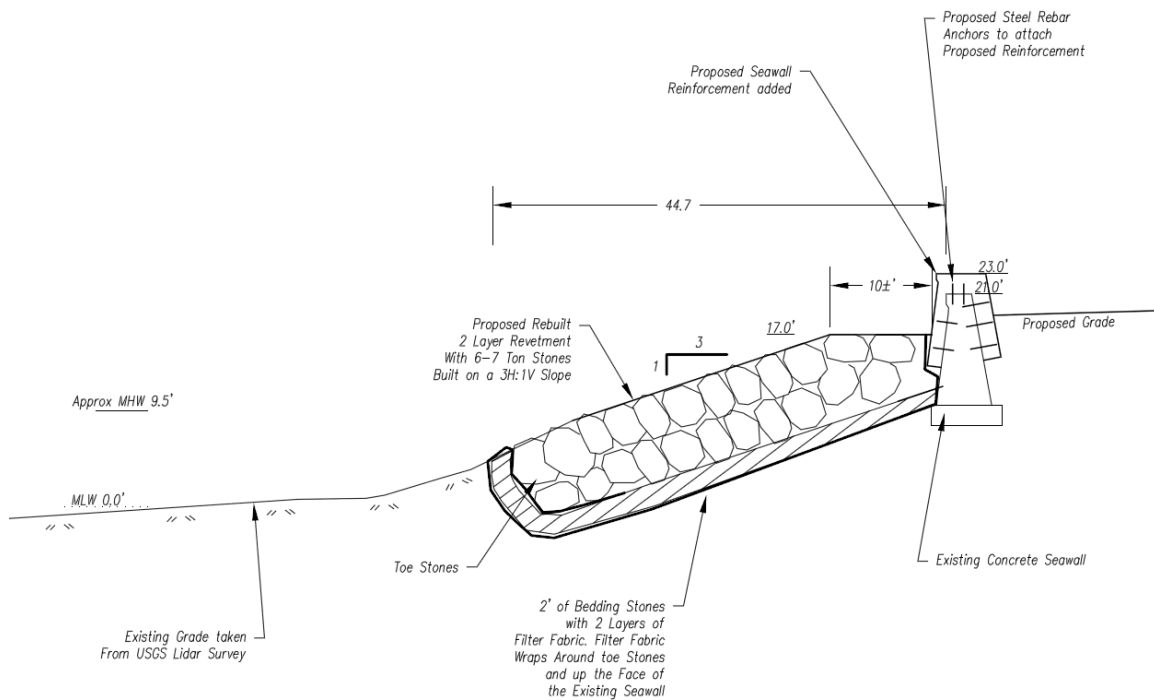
Typical seawall and revetment profile for station 10+25 to 16+50 with proposed 23 ft MLW seawall and 17 ft MLW revetment.
